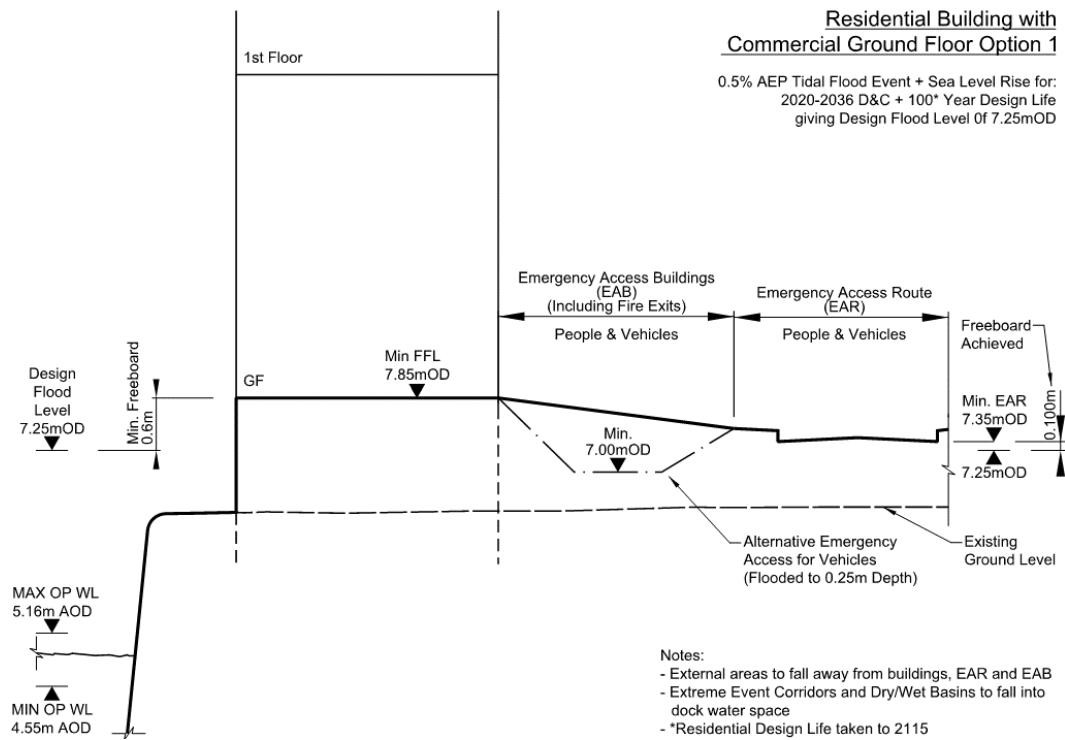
Residential Building with Commercial Ground Floor, Finished Floor Levels - Option 1
